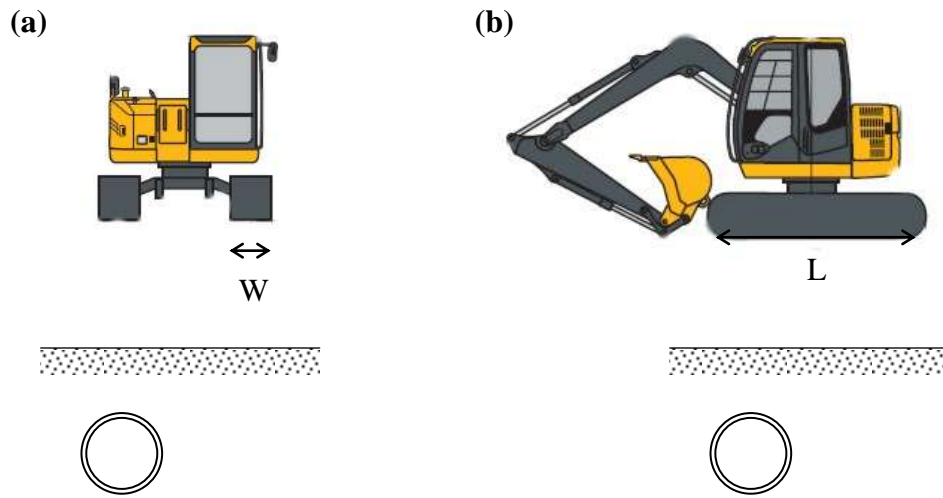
Construction Loads Used in FE Models: (a) Equipment Traveling Parallel to Pipe and (b) Equipment Traveling Perpendicular to the Pipe (W=Width of Track, L=Length of Track)
